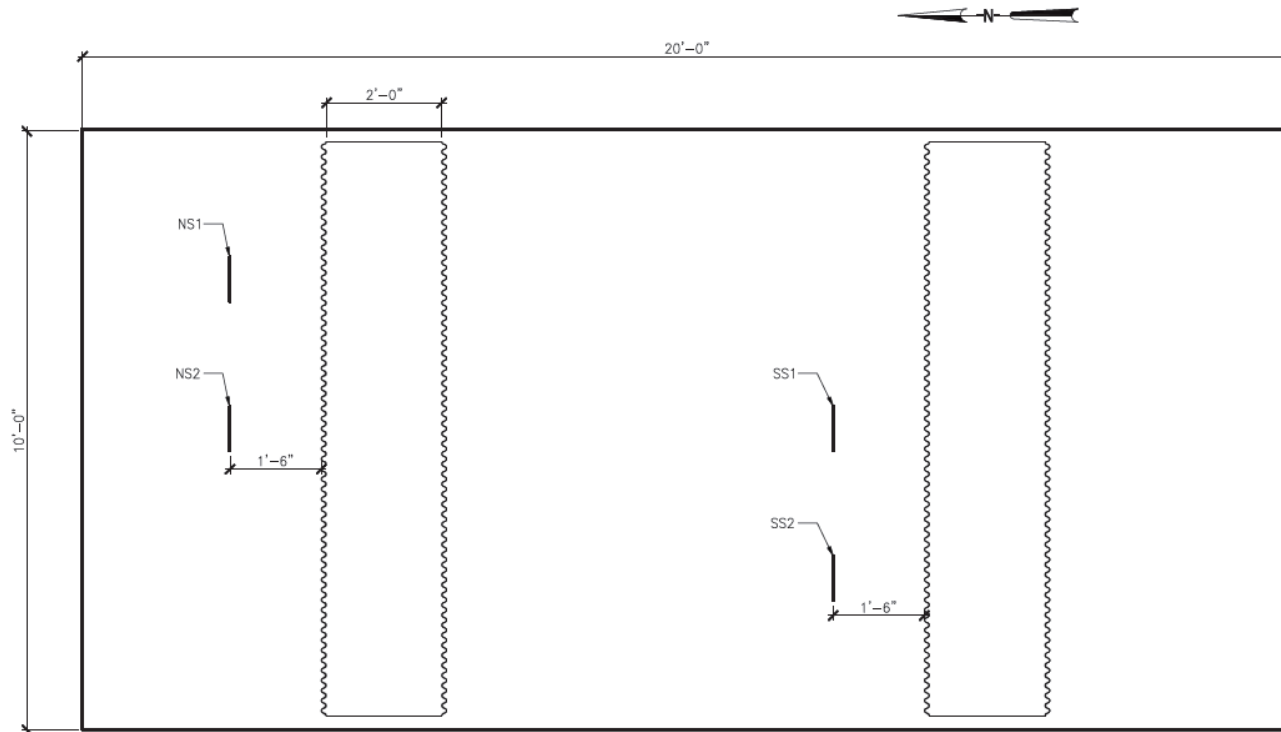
Earth pressure cell layout through Section F-F for 24 inch steel pipe test
